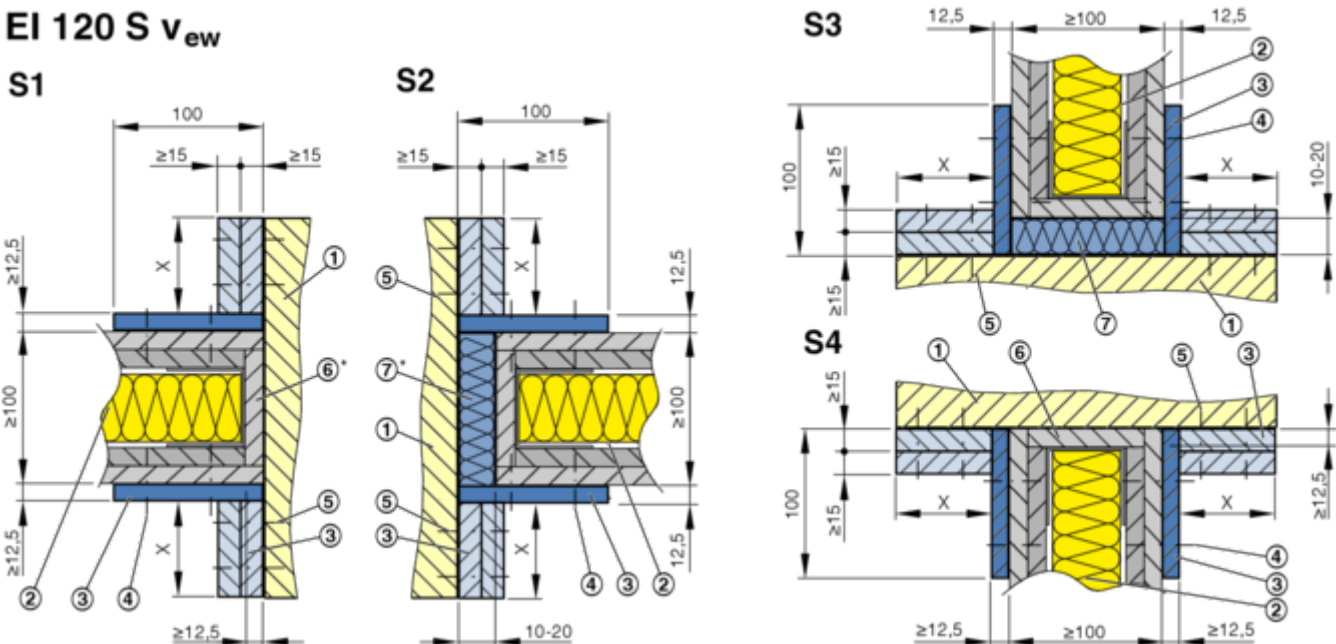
Details EK-JZ Dry mortarless installation in solid wall, solid shaft wall EI 120 S, legend ↪ Fig. 43
